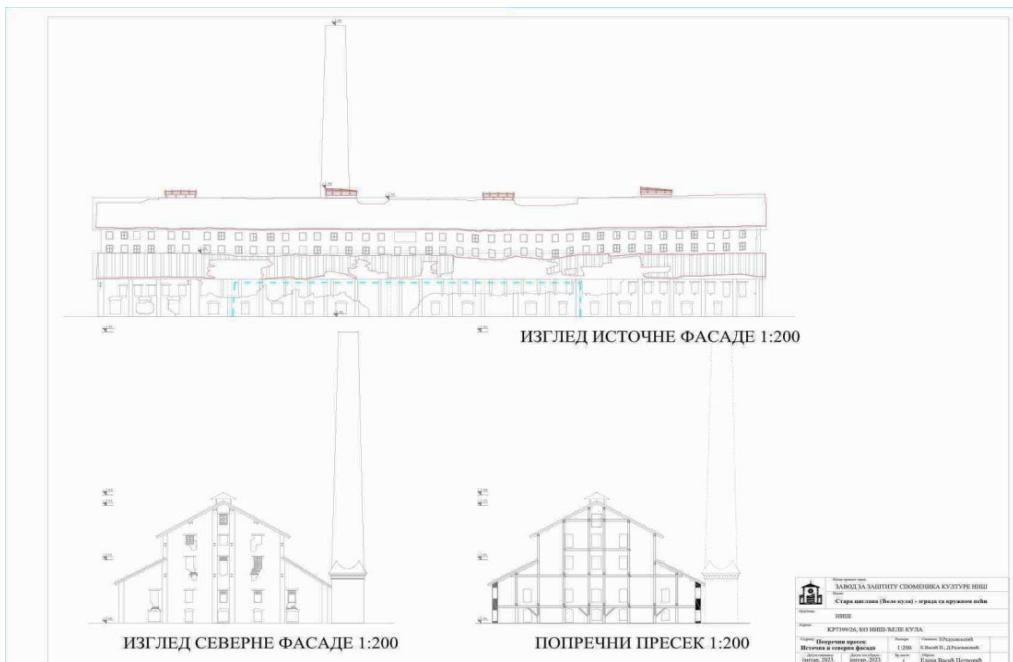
Brick factory main building (No 1 at the cadastral plan) with the preserved chimney and round kiln - "Old brickyard", E.V.Petrović (February 2023)
